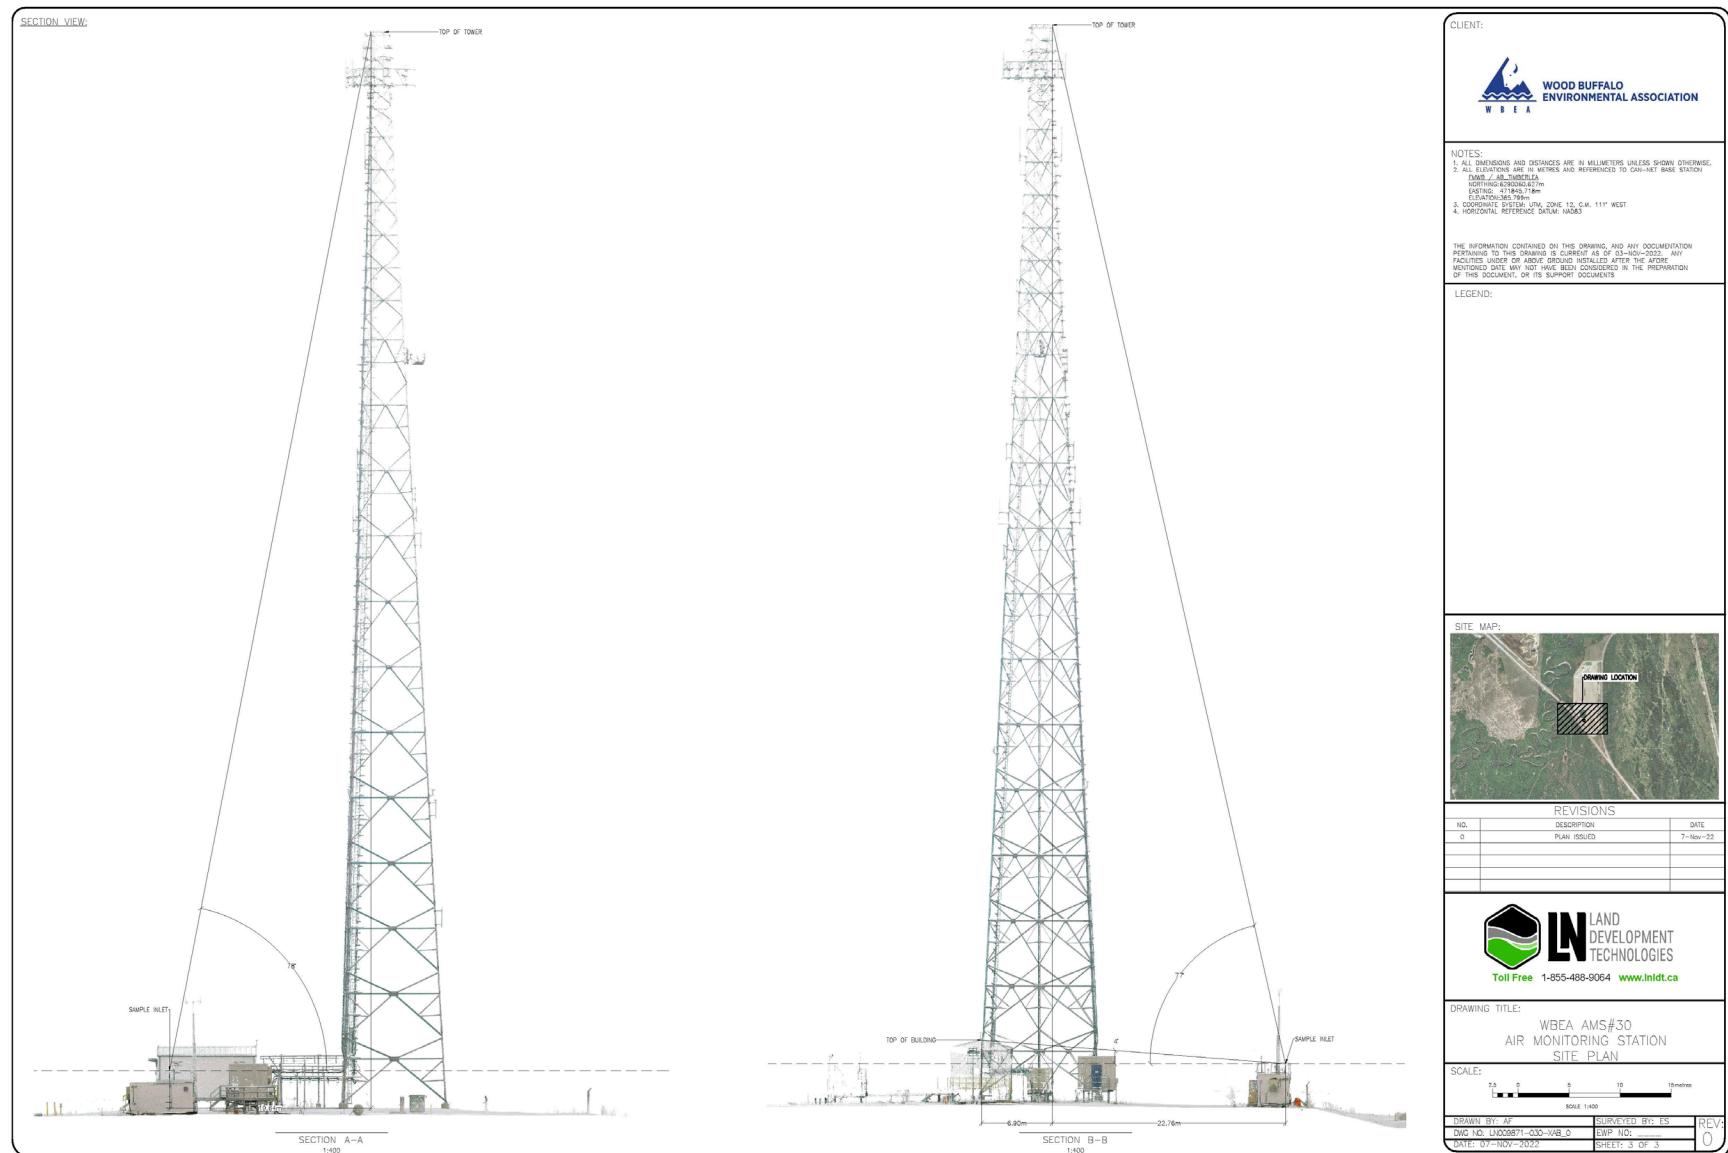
Cross-Sectional Elevation Drawing of AMS 30
